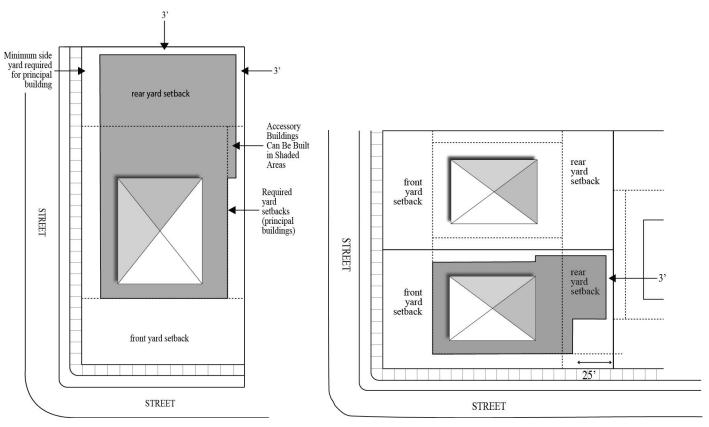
Accessory Building Placement for Corner Lots. Accessory buildings may be located in shaded areas.
